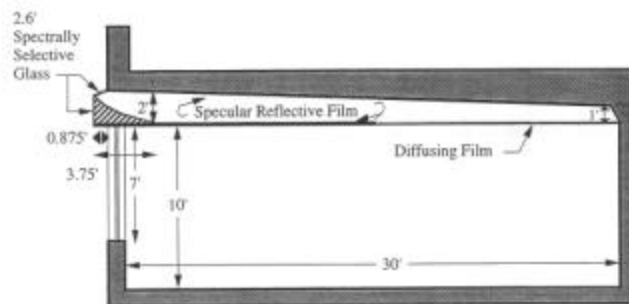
Section of trapezoidal light pipe design (Light Pipe C).
